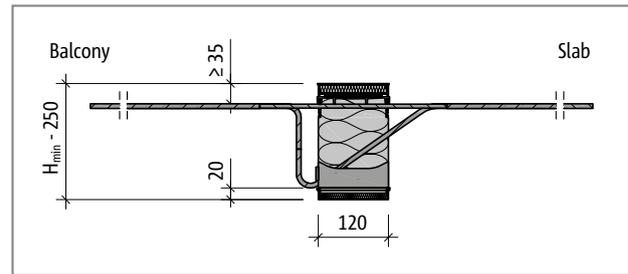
Schöck Isokorb® XT type K-M5, M6: Product section
